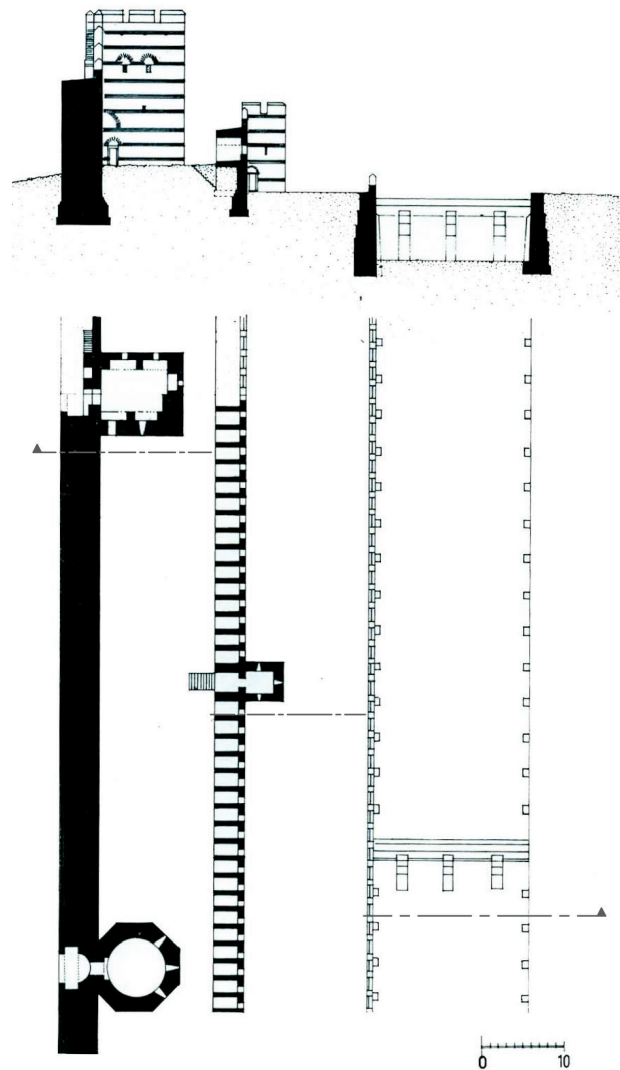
Constantinople. Section and elevation drawing of the land walls.
